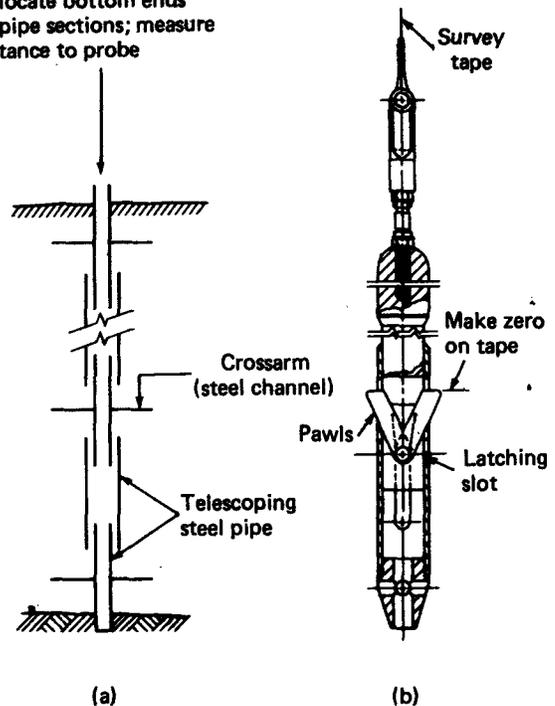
Crossarm gage: (a) Schematic of pipe arrangement and (b) measurement probe (after USBR, 1974; courtesy of Bureau of Reclamation).
